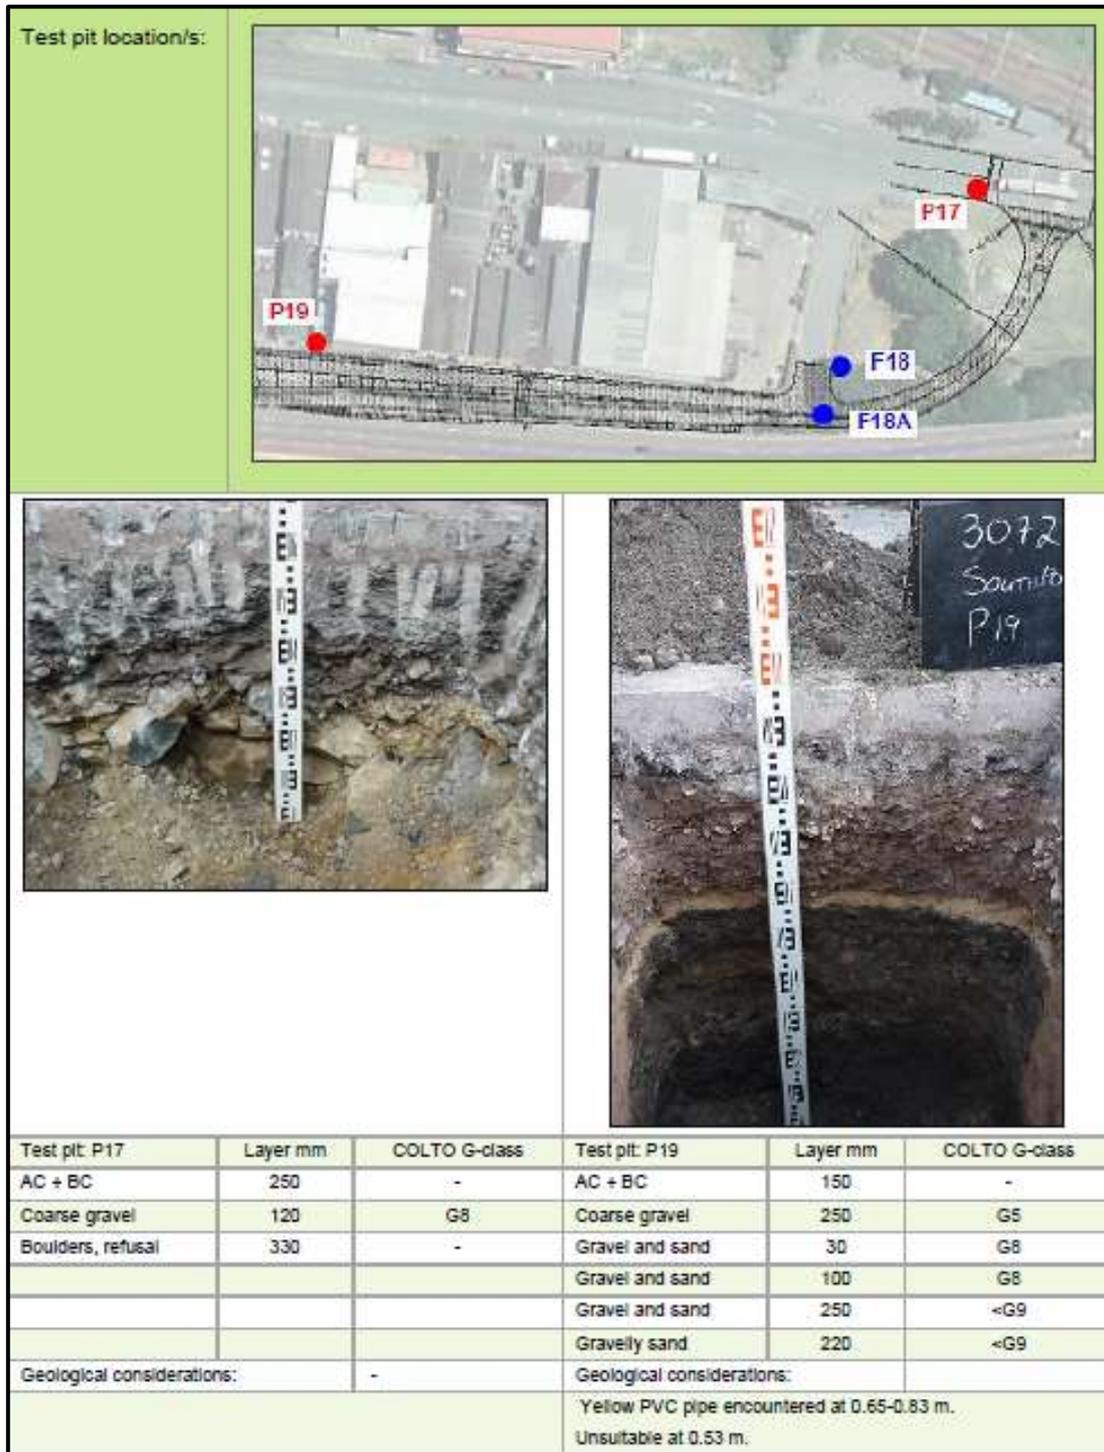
M4/South Coast Roads Test Pit Locations (Rossburgh)
